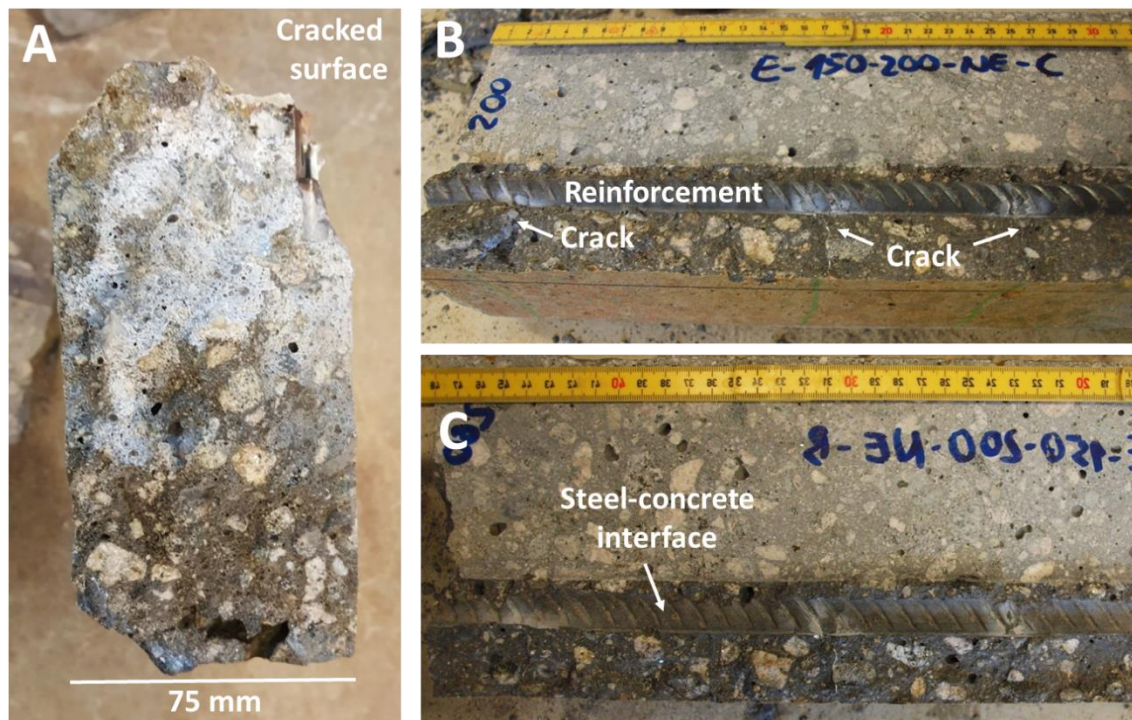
A: White precipitate on crack surface from Beam B, crack located at 100 cm (sample split along the crack); B and C: Beam E, white precipitate on the reinforcement and at the steel-concrete interface (after removing reinforcement) near cracks, section 150-200 cm
